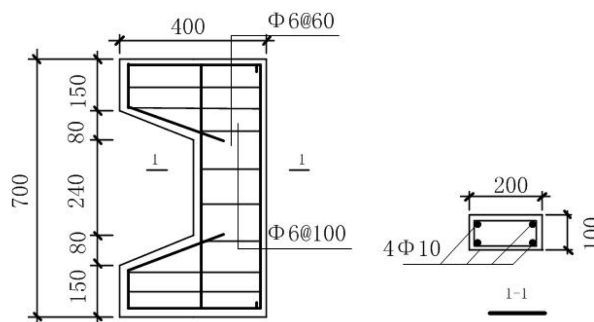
Dimensions and reinforcement arrangement in the column specimens (Unit: mm)
